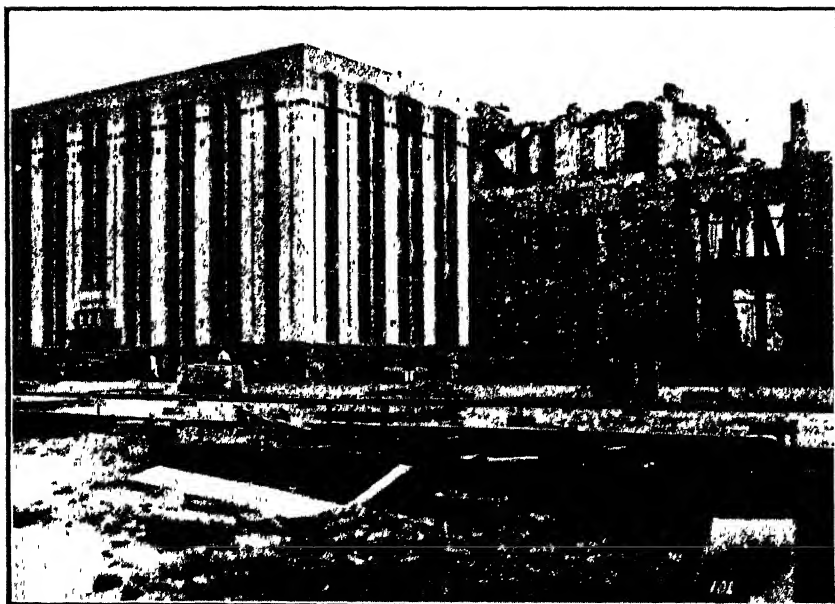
A 4½ STOREY REINFORCED CONCRETE BUILDING AT MARUNOCHI CENTRAL, TOKYO, JAPAN.
